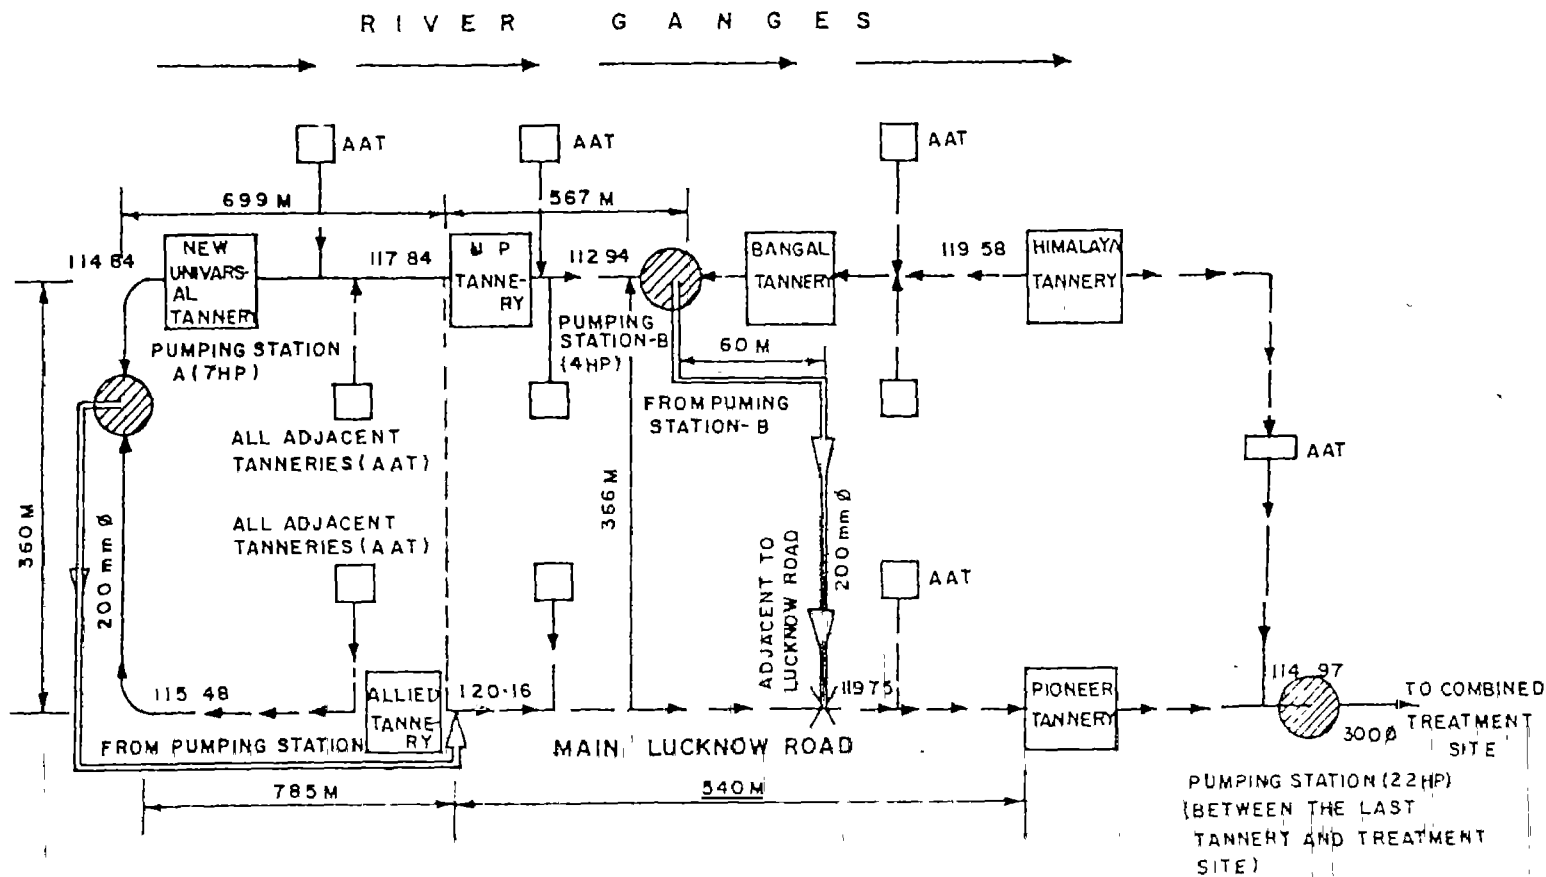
JOINT WASTEWATER CONVEYANCE SYSTEM
